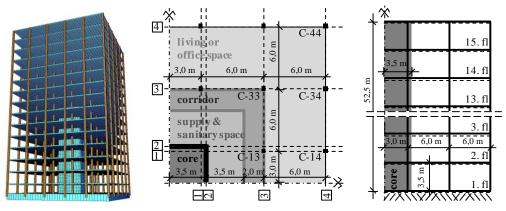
holistic 3D model (left); floor plan (center); vertical section (right)
